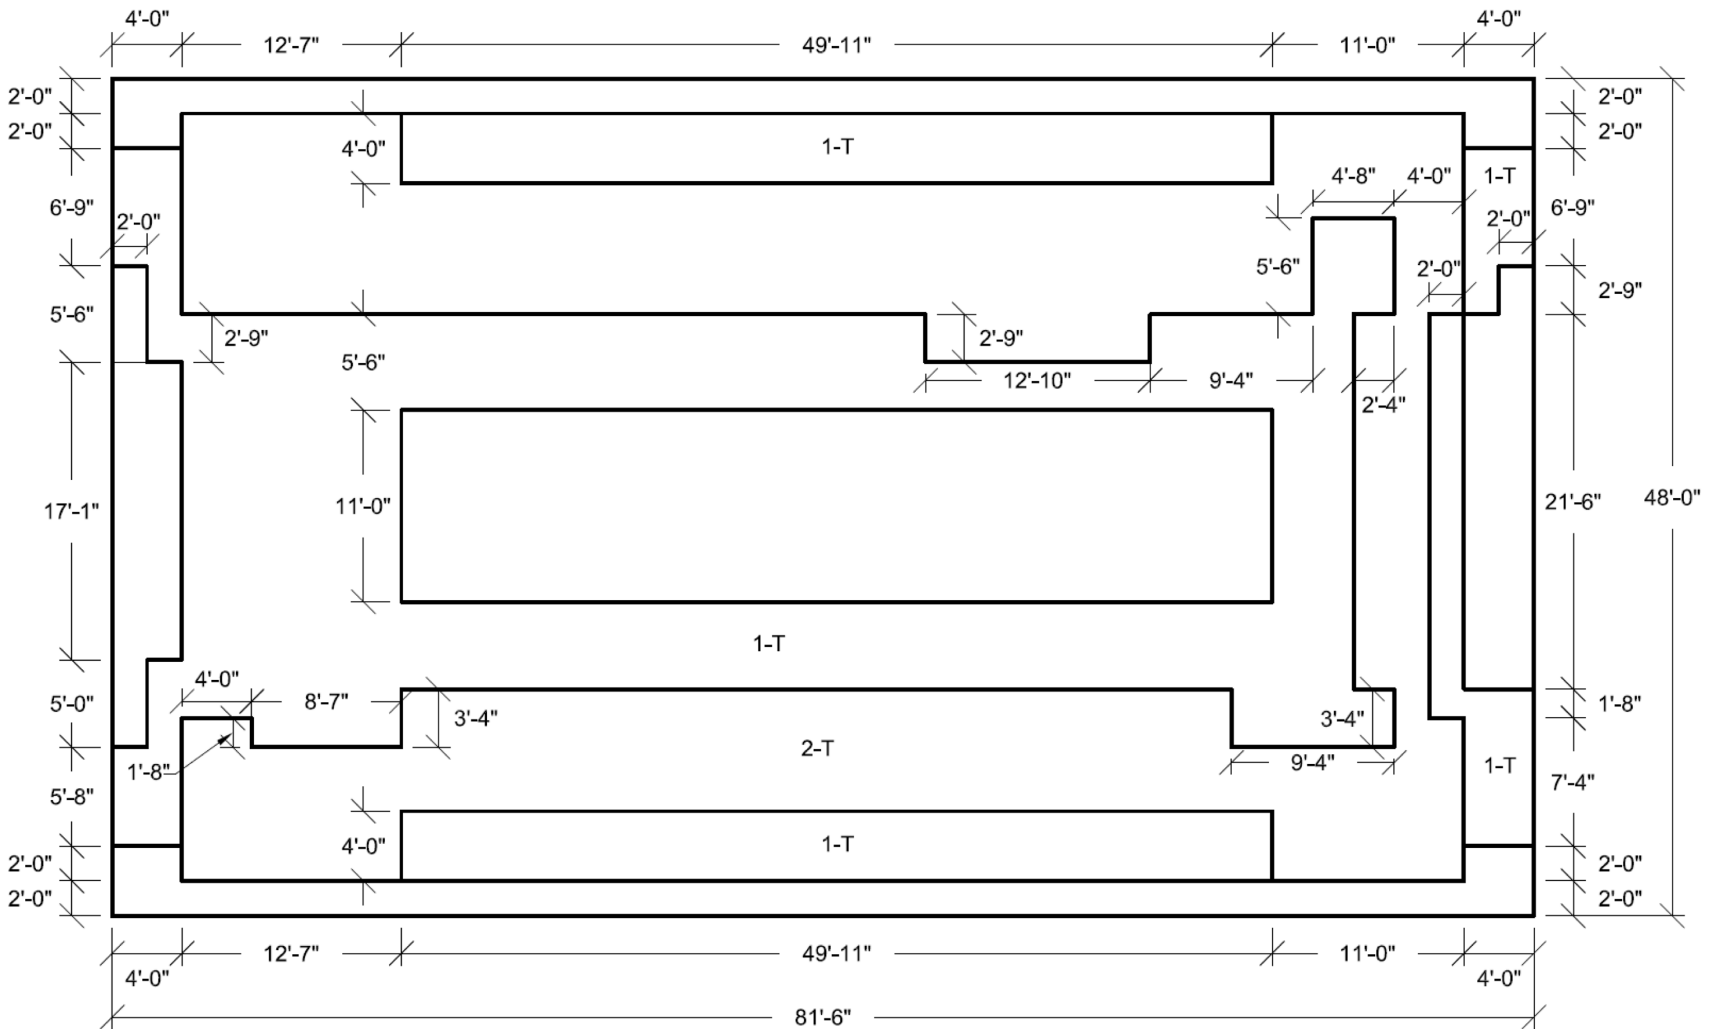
H.6-146 DGFOV Slab 1 Looking Down Transverse Reinforcement Zones
